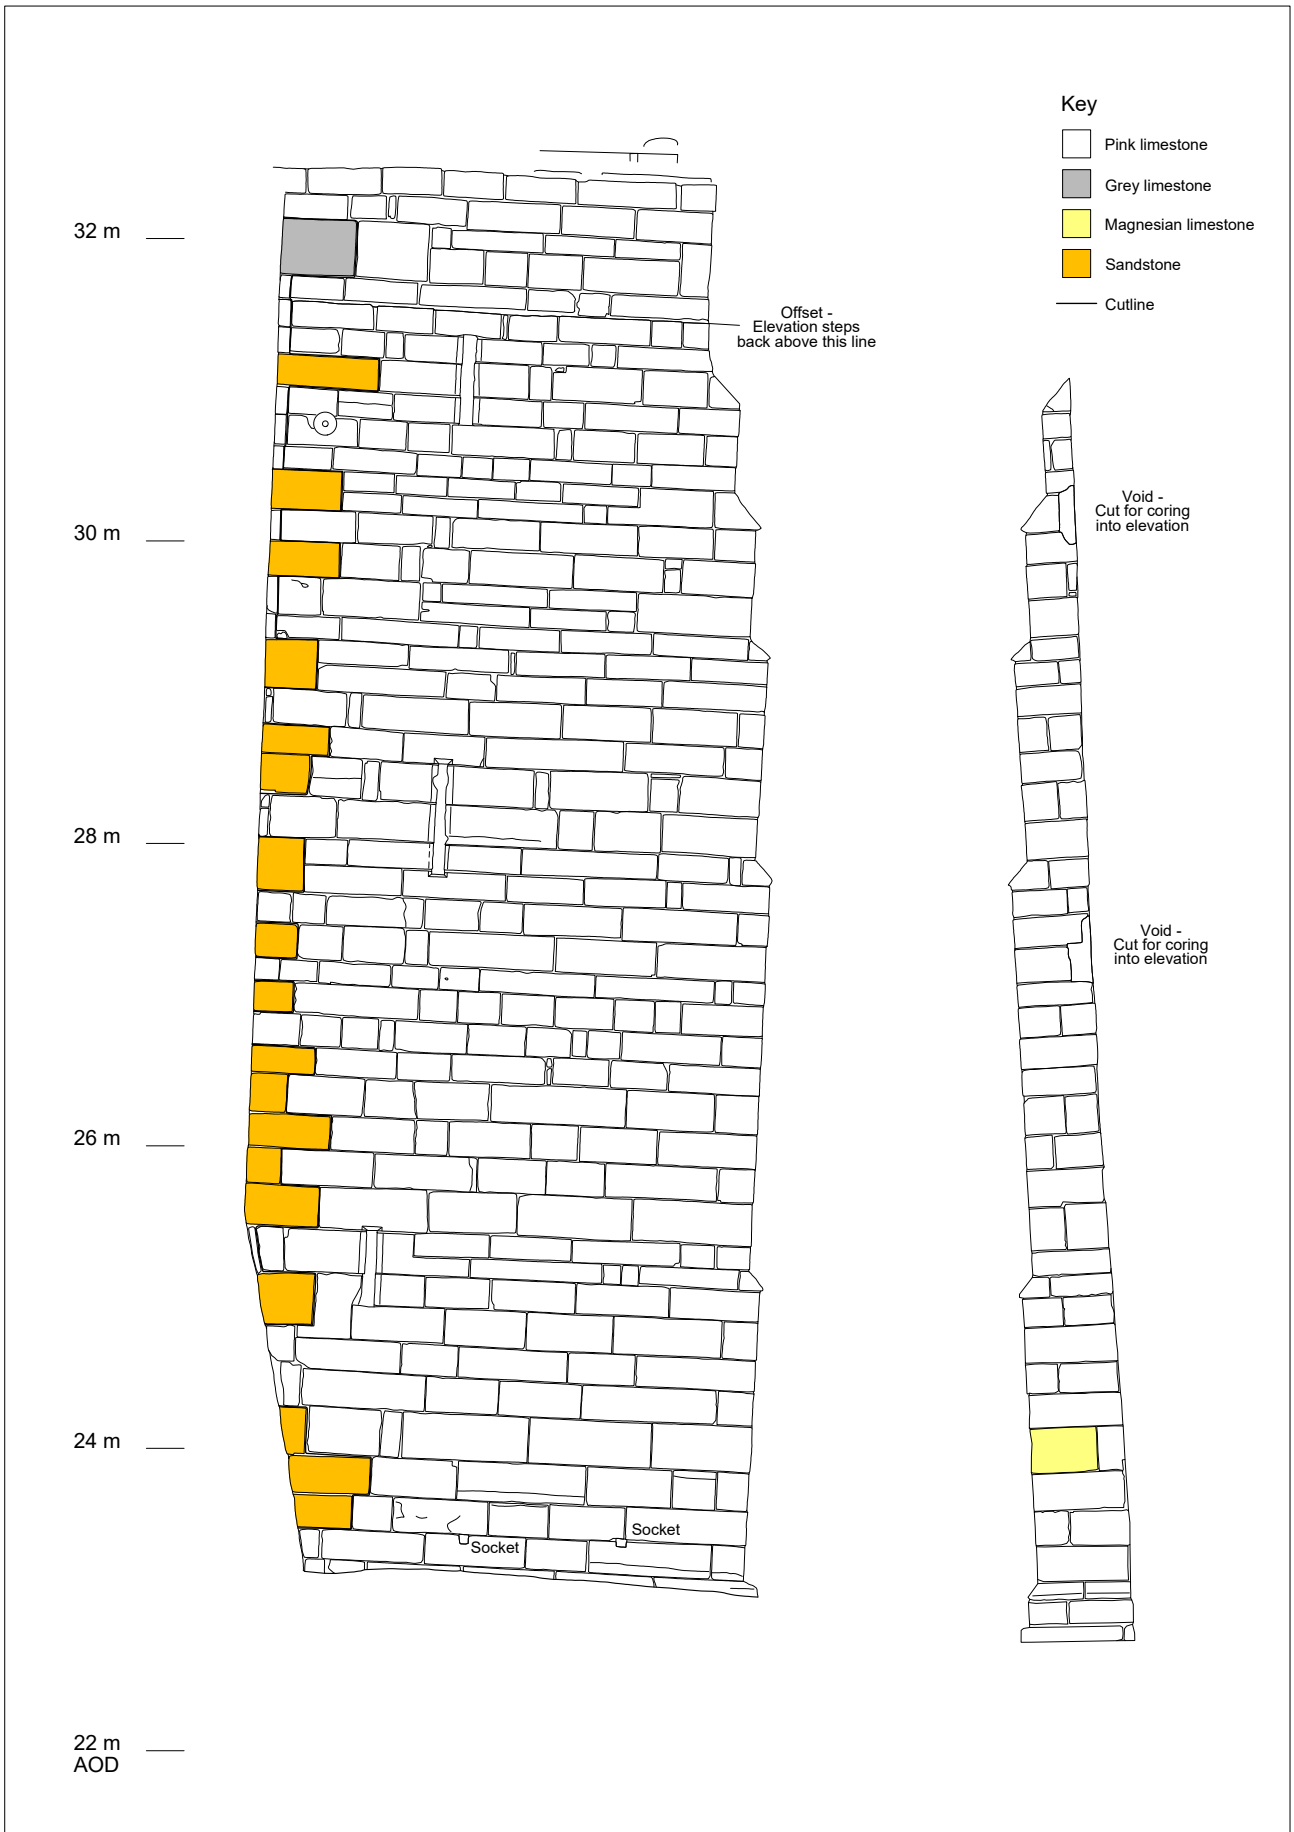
External southwest elevation of the forebuilding Scale 1:50@A4
